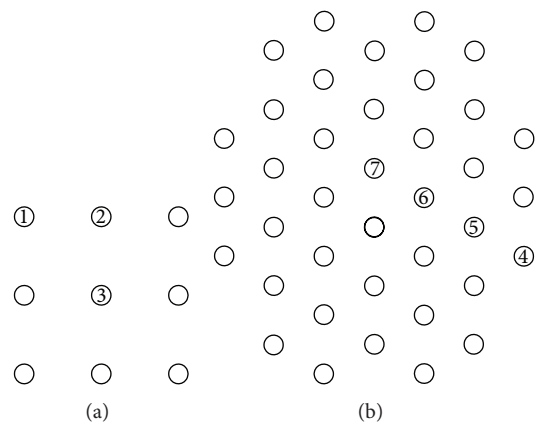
Arrangement of pile group and the code of typical piles, (a) rectangular arrangement (b) hexagonal arrangement.
